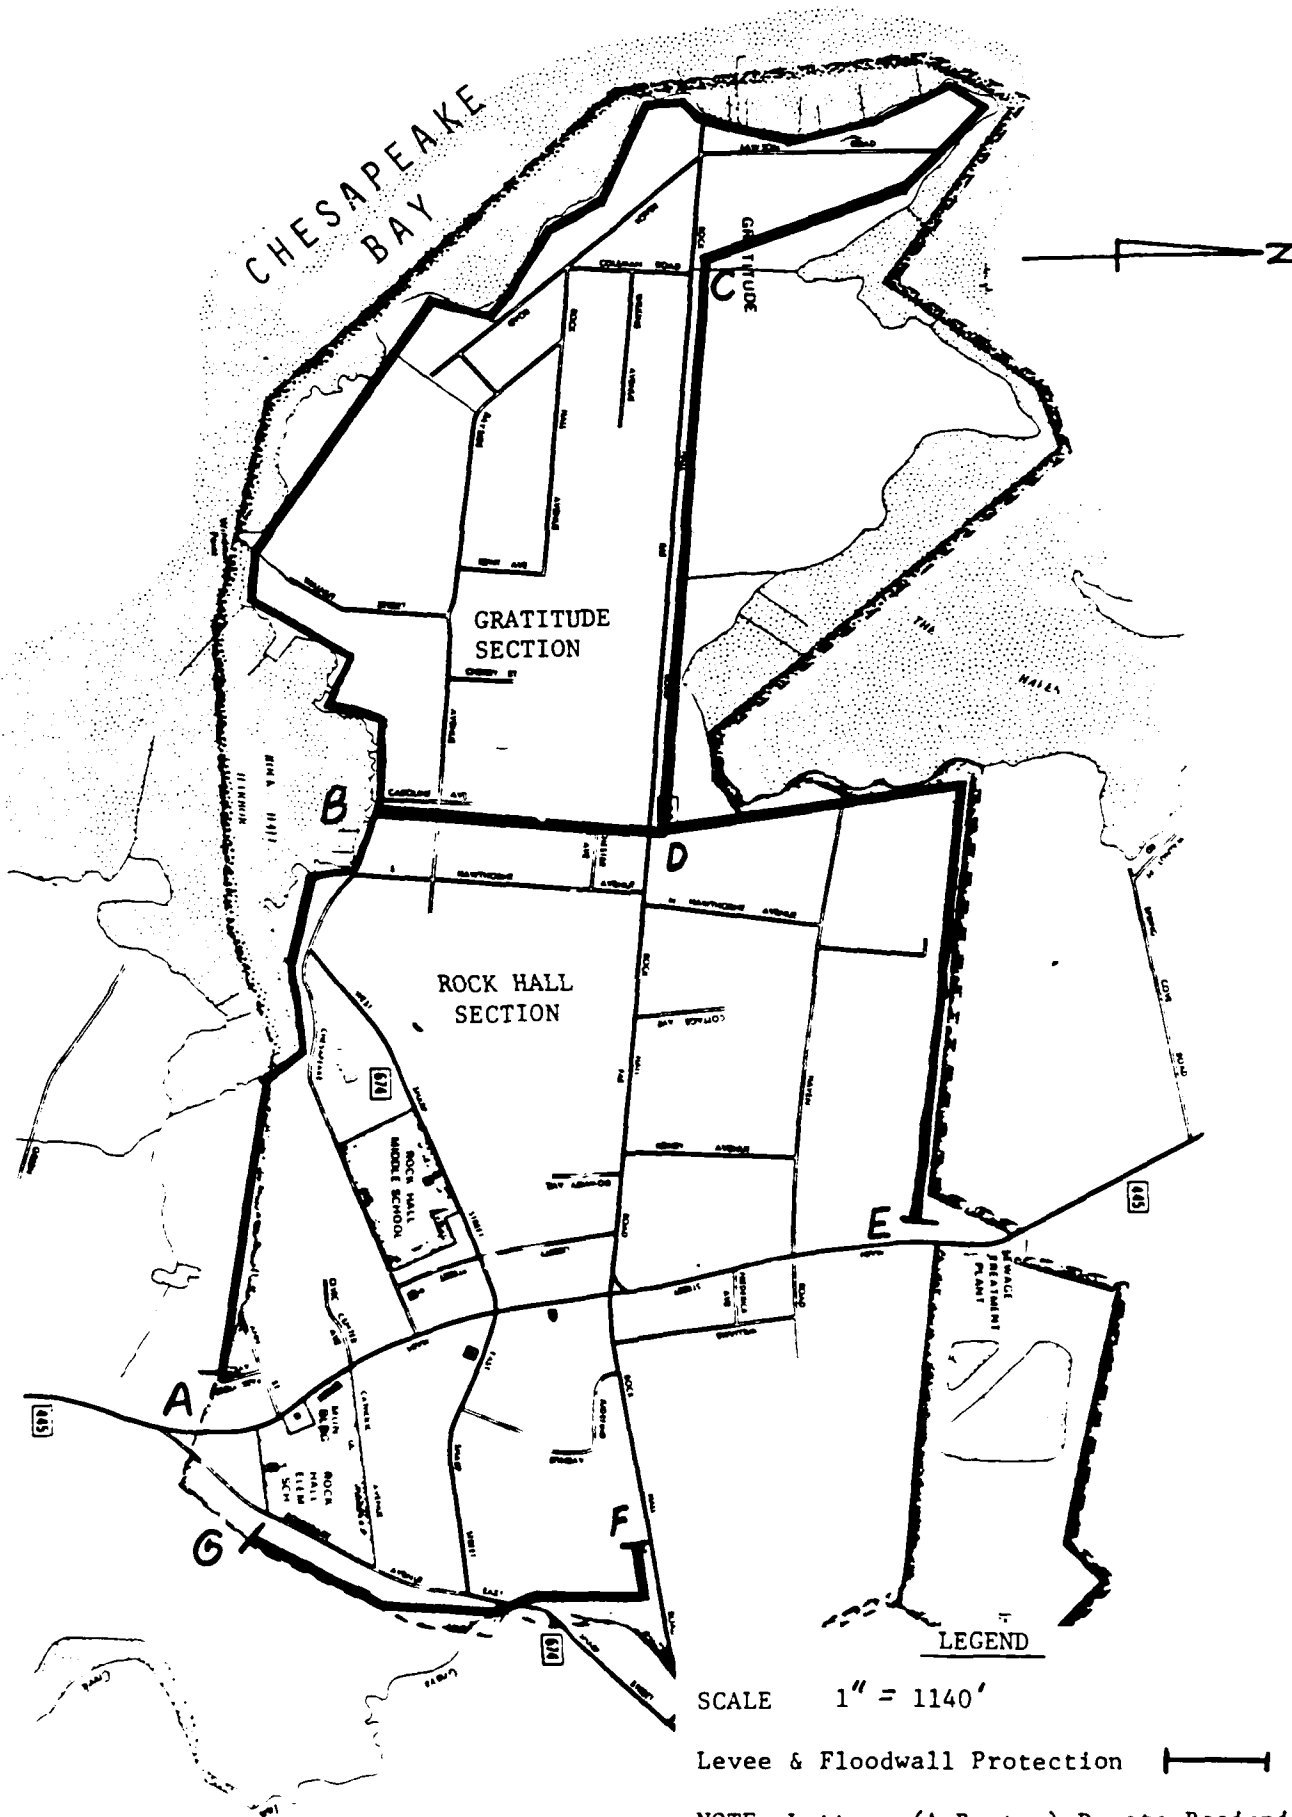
PLAN LOCATION OF STRUCTURAL MEASURES FOR ROCK HALL, MARYLAND
